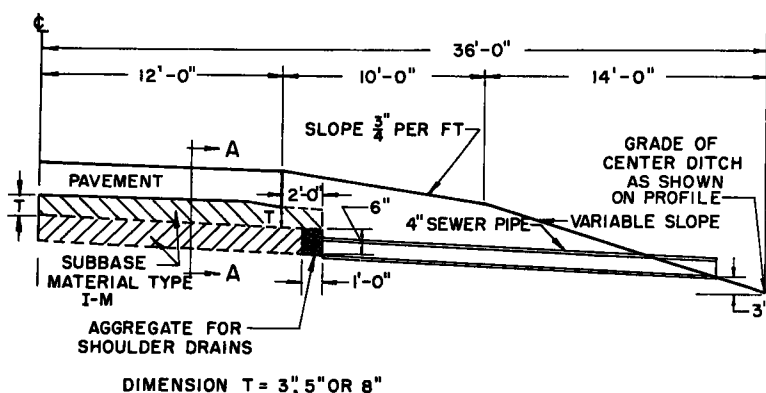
Typical cross-sections of drains used in trench sections of open-graded stone (type I-M), median side.
